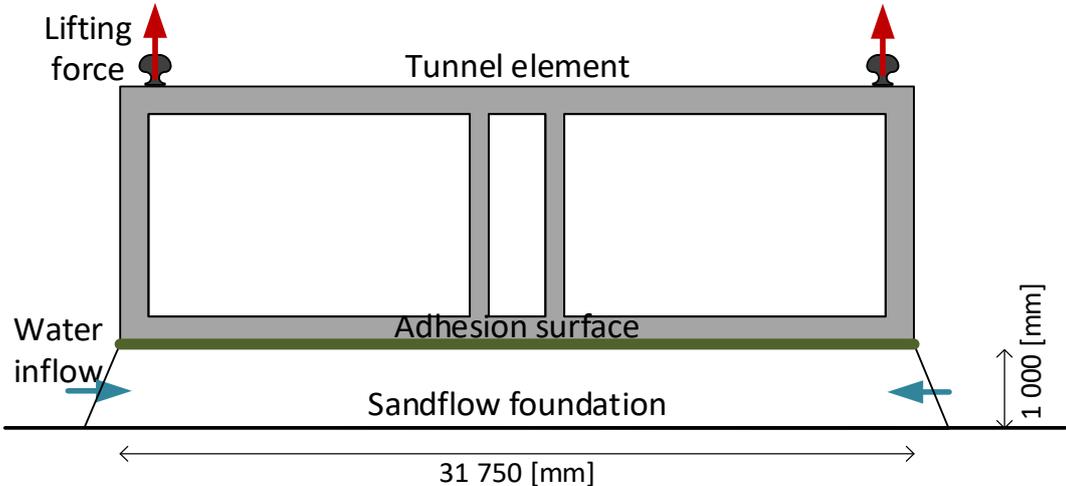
, SOIL ADHESION SITUATION SKETCH
